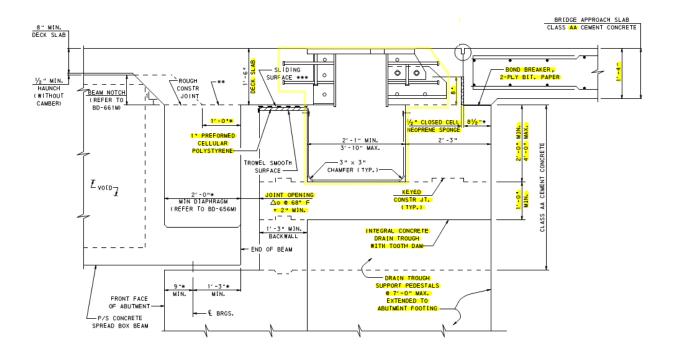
Approach slab with finger plate joint with an integrated drain trough
